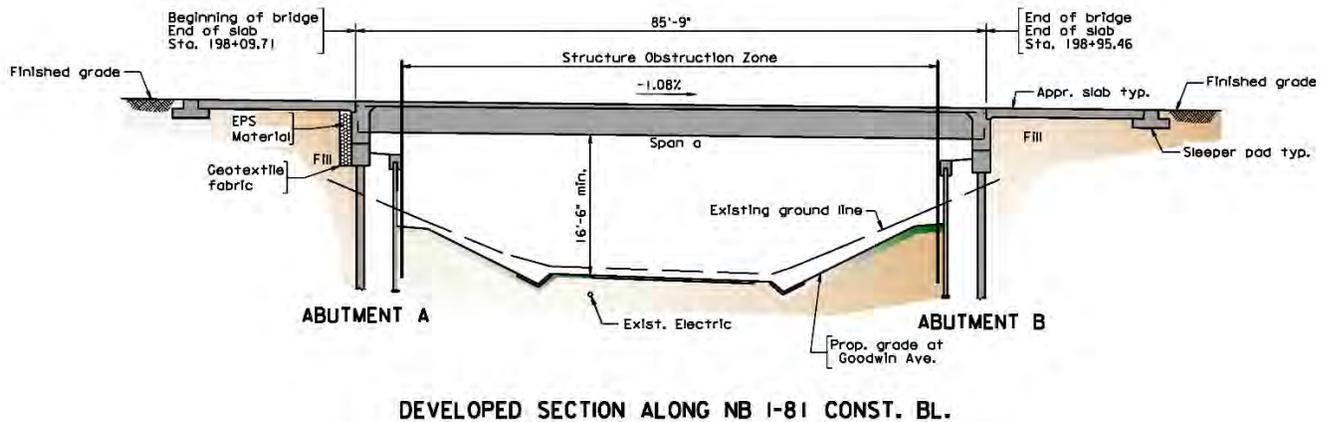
Elevation Section - I-81 Over Route 635 (Goodwin Avenue)
